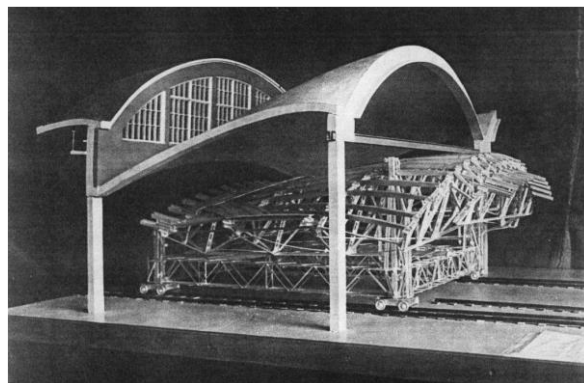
A model of travelling shuttering for the reinforced concrete shell roof of the shop, developed by "Tekstilproekt", Russia
